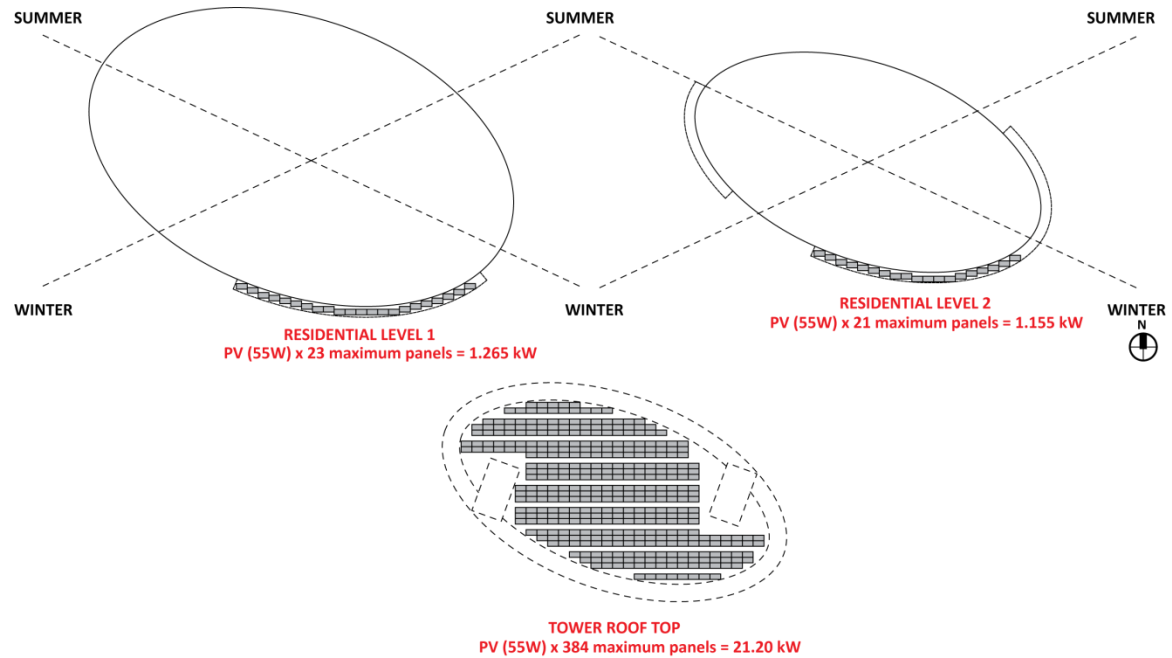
PV layout on over-hang in both residential levels and roof top
